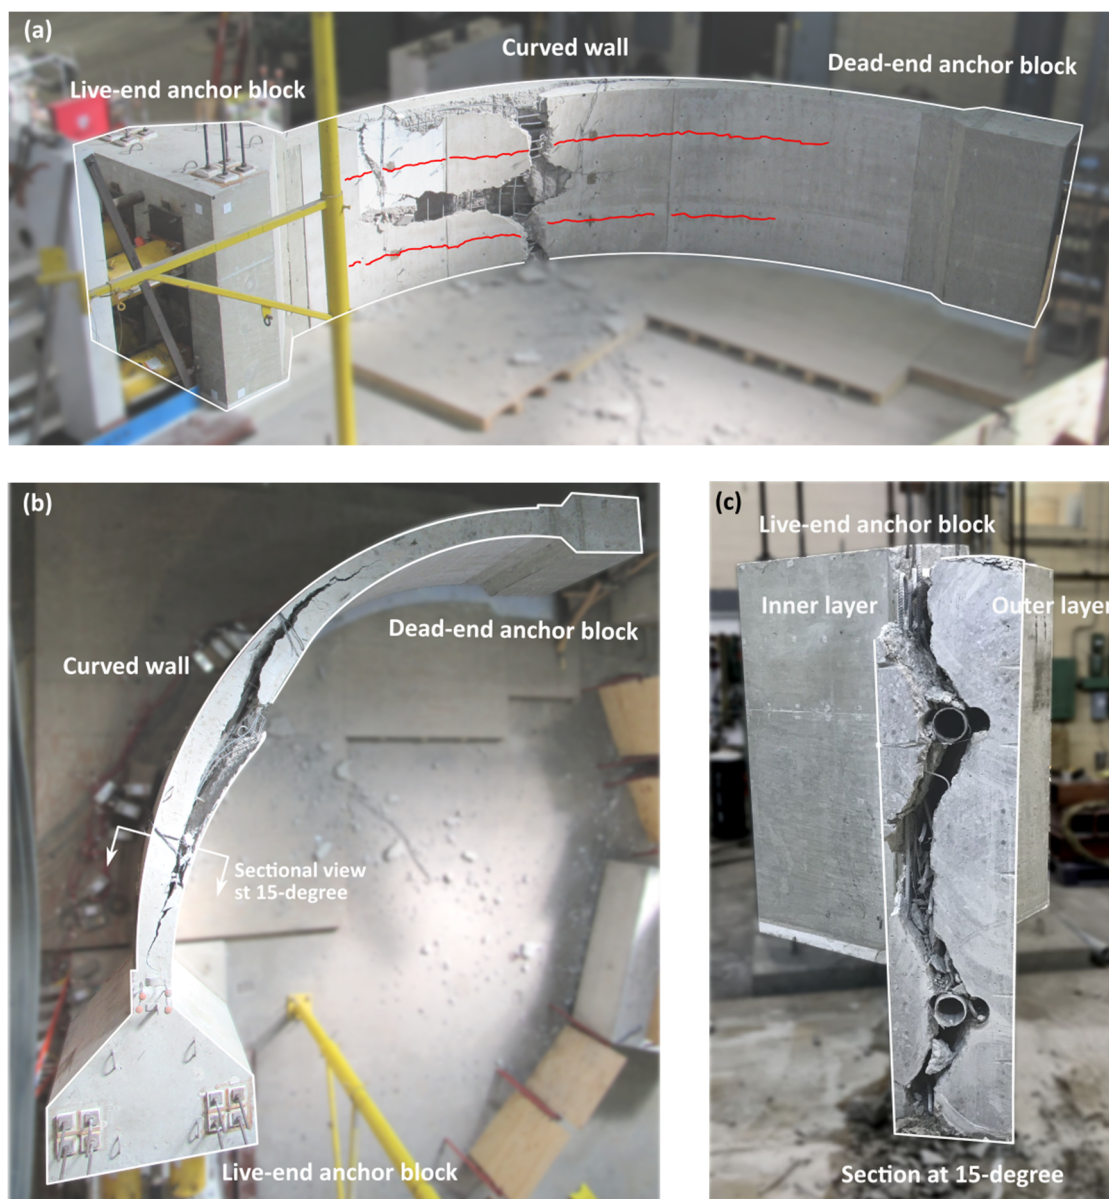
Crack patterns of specimen after delamination failure: (a) front-view; (b) top-view; and (c) sectional view at 15-degree location
